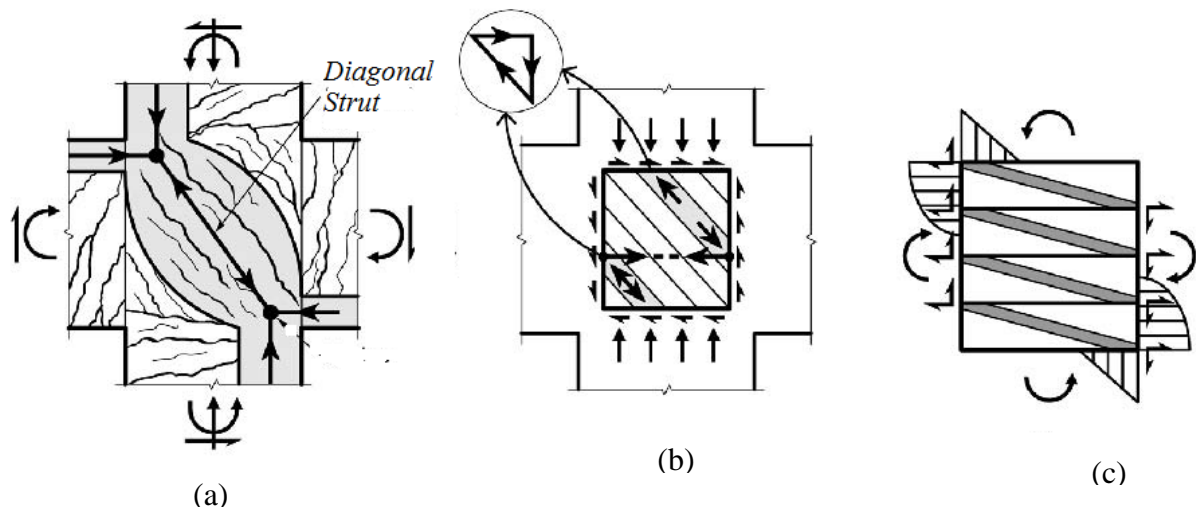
(a) Mechanisms of shear at an interior joint (b) Sub-strut mechanism. (c) Truss mechanism. (E. Englekirk 2003)
